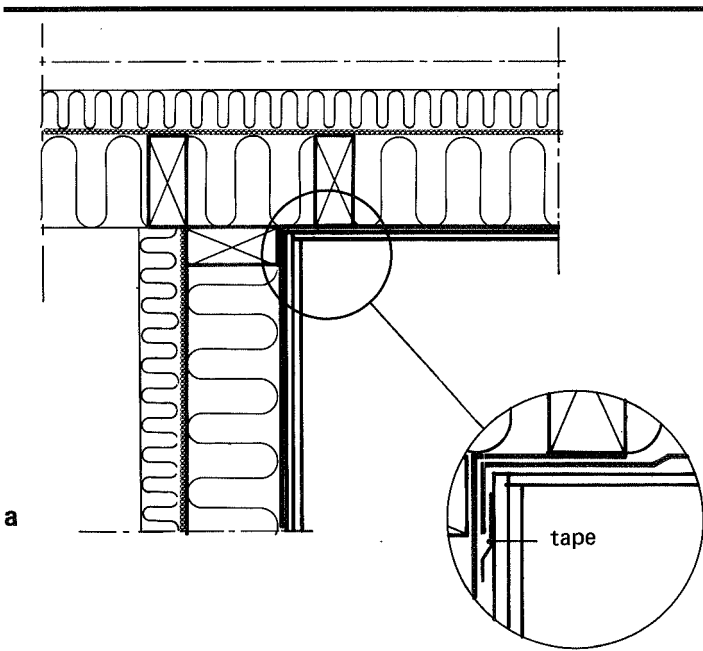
Jointing gable heads and roof trusses in dormer houses. An angle profile replaces the »nogging pieces« for attaching internal cladding sheets on the wall. The vapour barrier/air seal should be overlapped against the ceiling joist in order to achieve good clamping. The wall foil must be fitted before the ceiling element.
